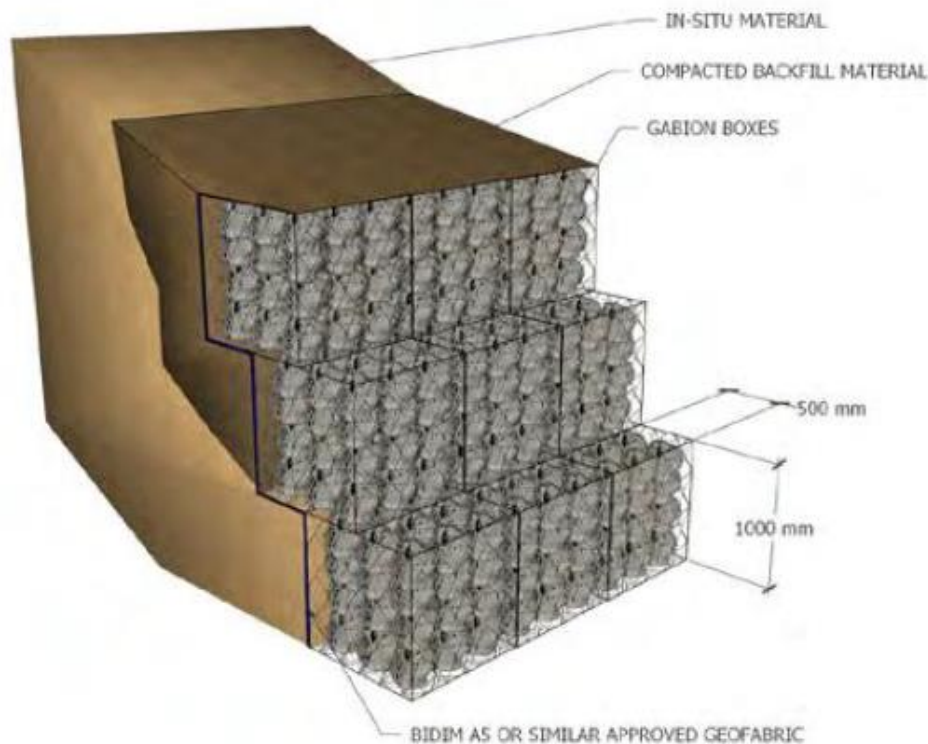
Typical bank protection using gabions (Groundtruth, 2020)
